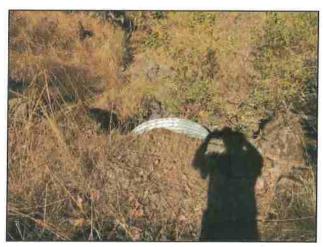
River Rd Looking @ 36" Culvert Out (Dual?)
